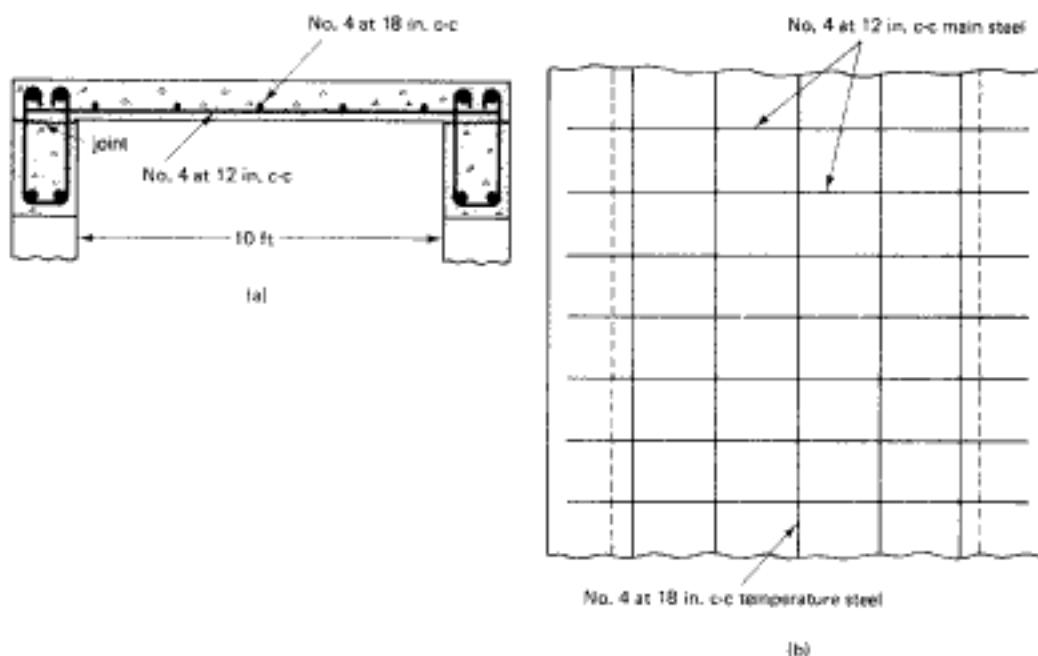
@Seismicisolation One-way slab in Ex. 5.4: (a) sectional elevation; (b) reinforcement plan.
